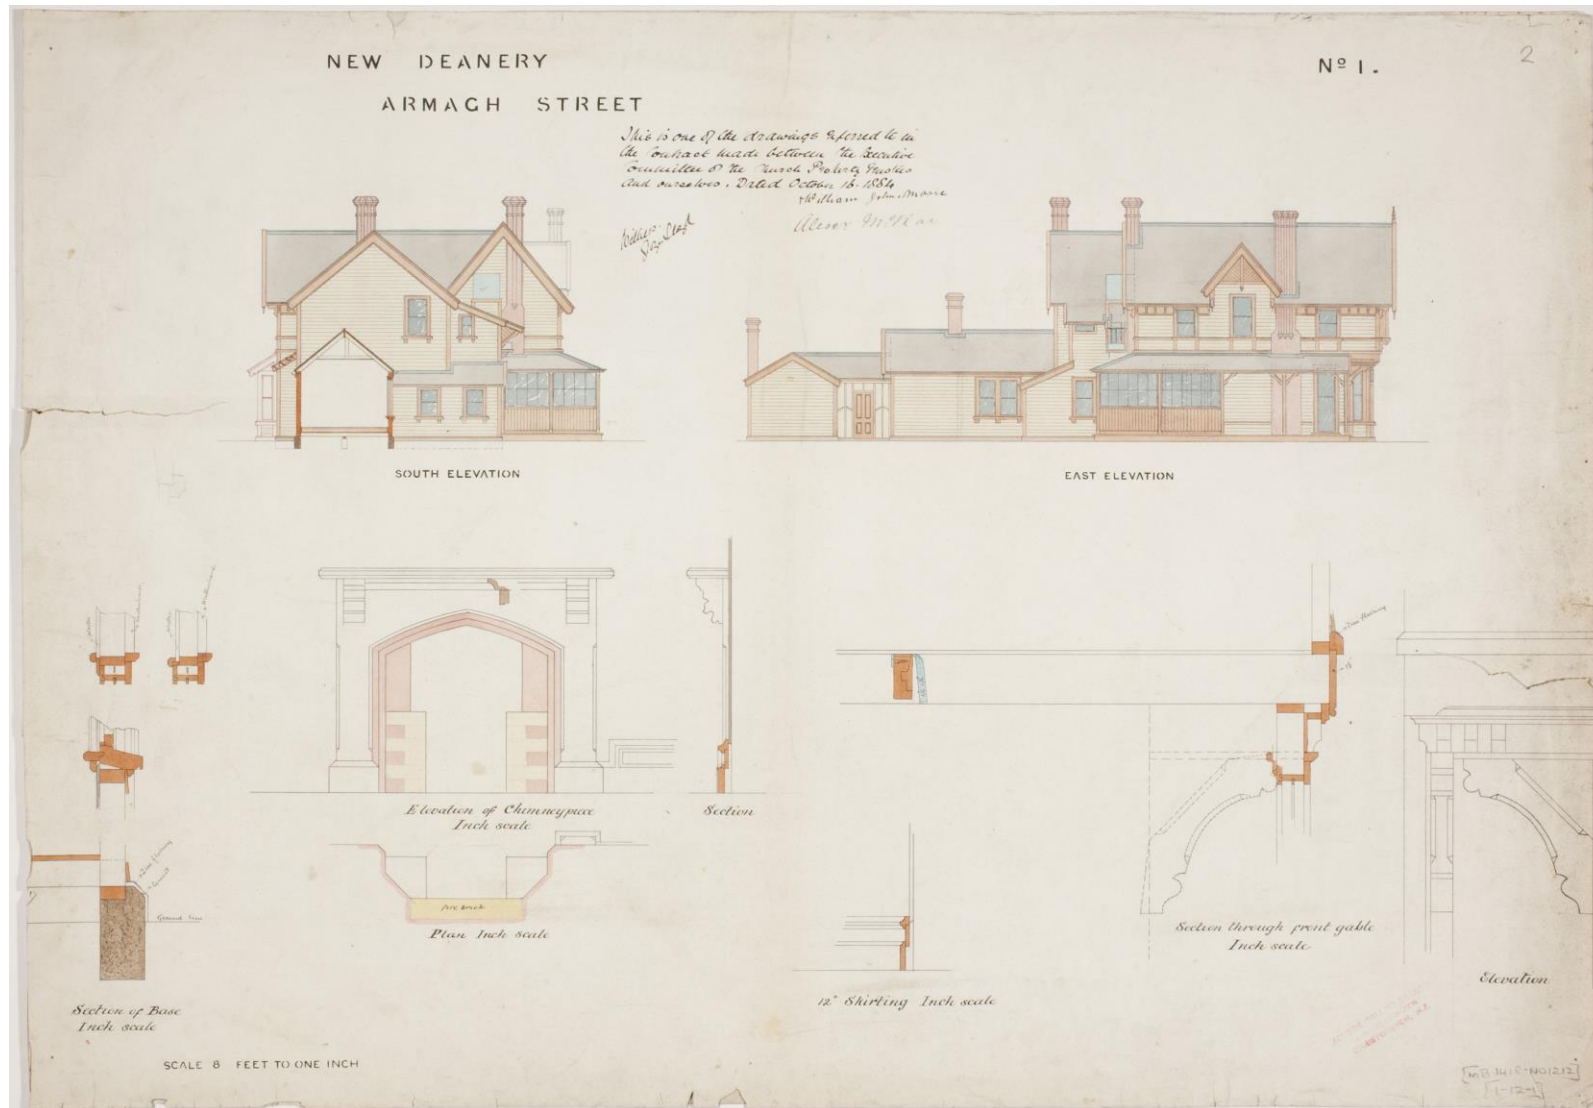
Armson, Collins and Lloyd, New Deanery, Armagh Street, elevations and details (1884).
